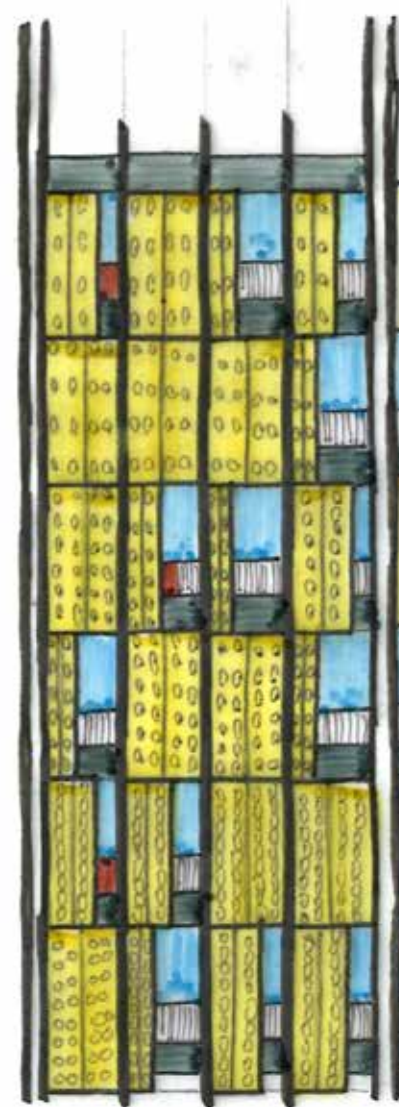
Initial design exploration 2 - West facade elevation
